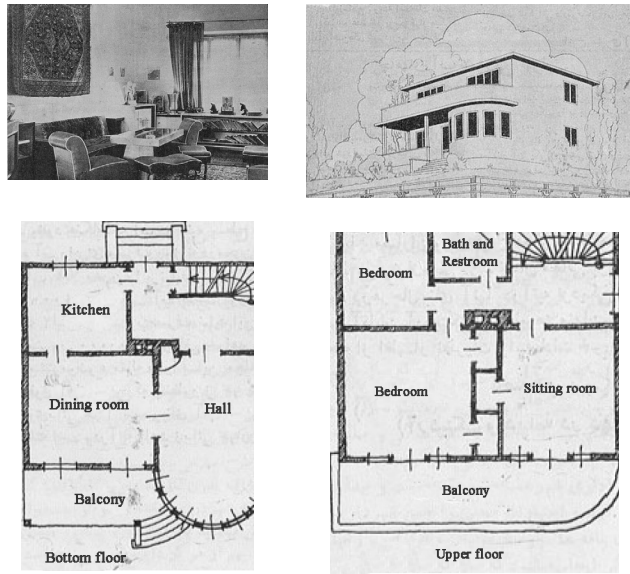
Interior Space and Exterior Façade, and Plans of a House related to Pahlavi II in Tehran (Architect 1926)
